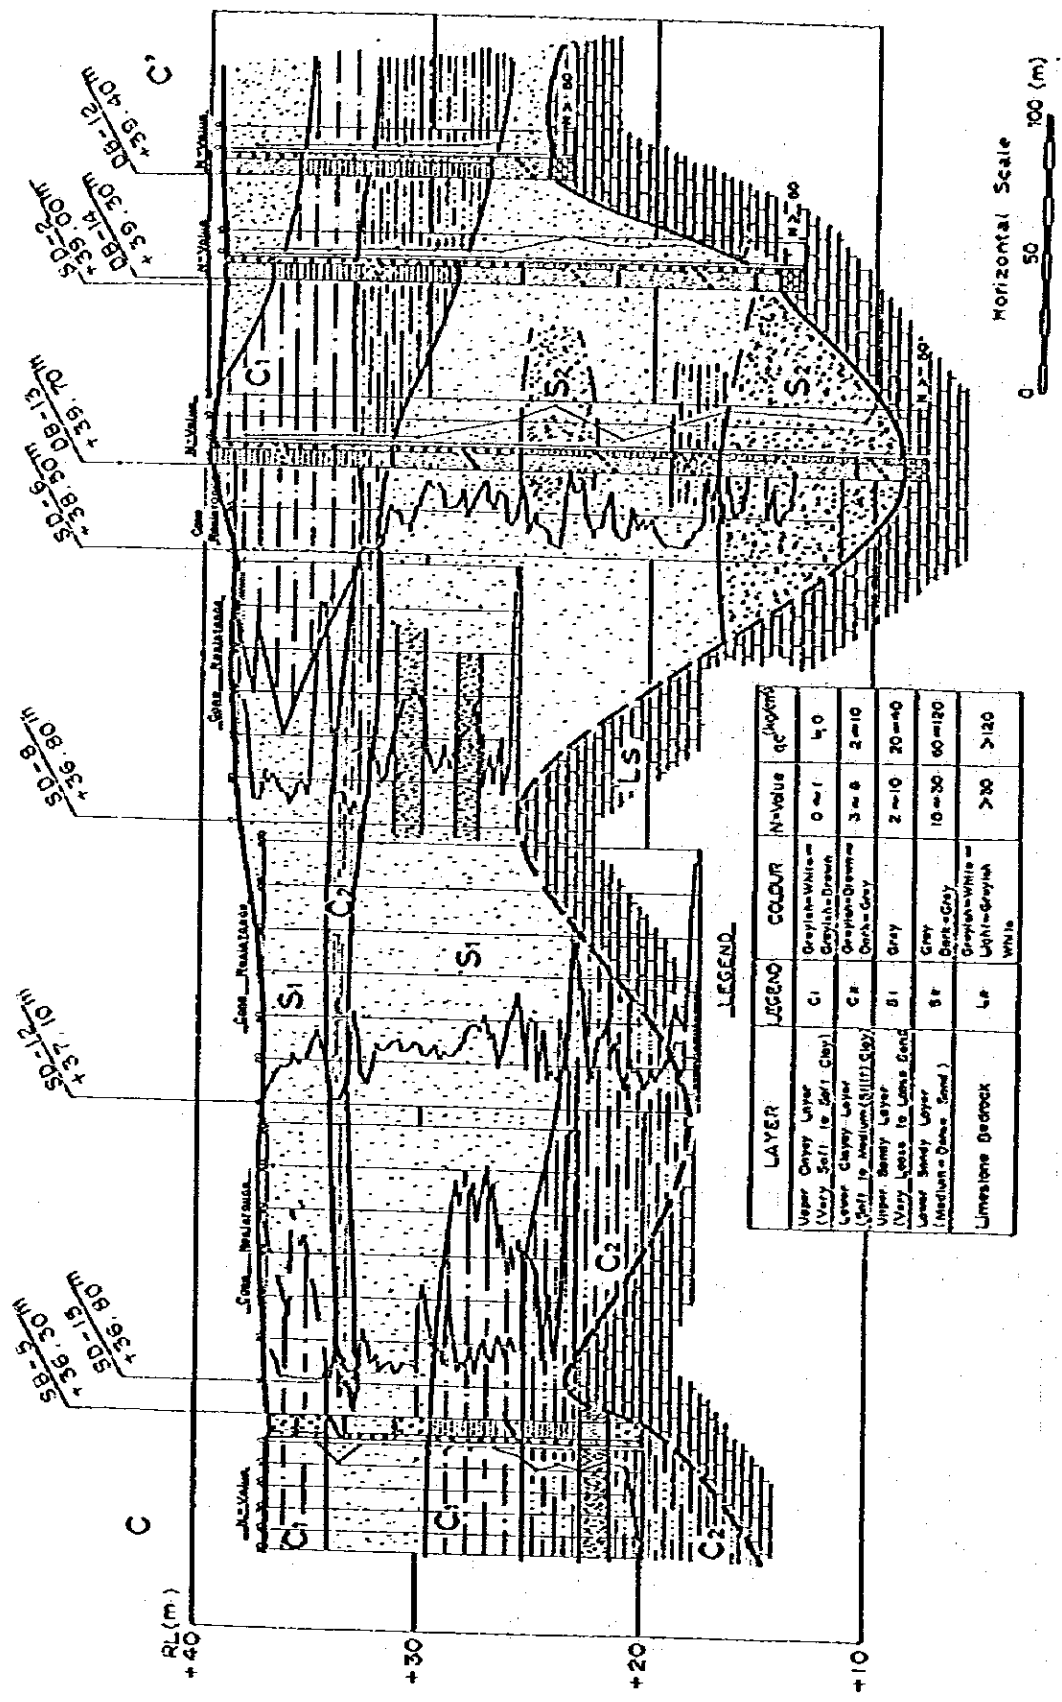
Soil Profile at Sentul, Cross Section C-C'
